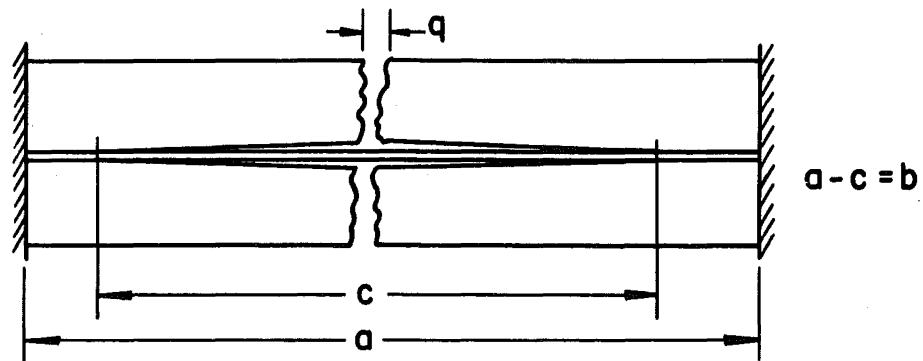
FULLY RESTRAINED CRACKED PAVEMENT
